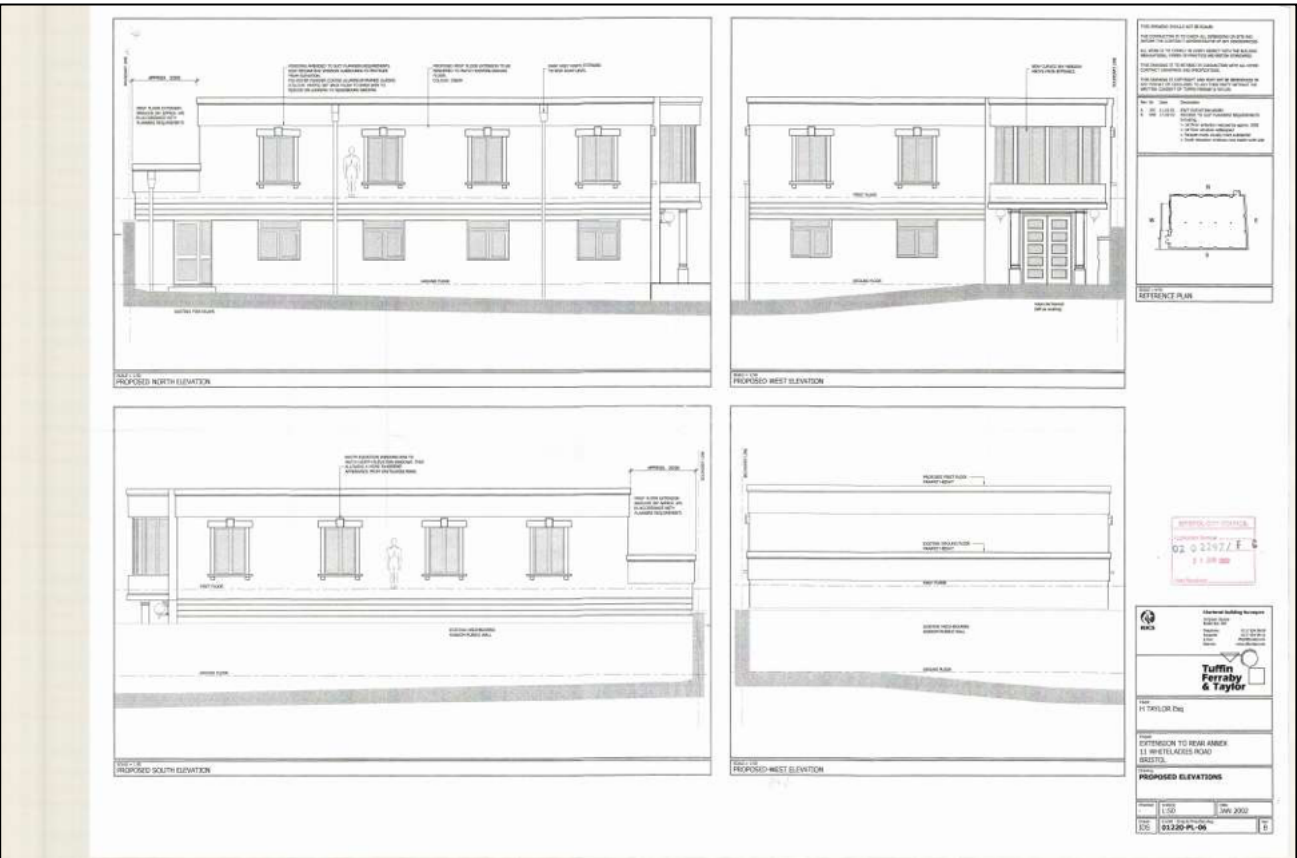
Elevation drawing form consented application for first floor extension to the Annex. Planning reference 02/02297/F/C. Never implemented
